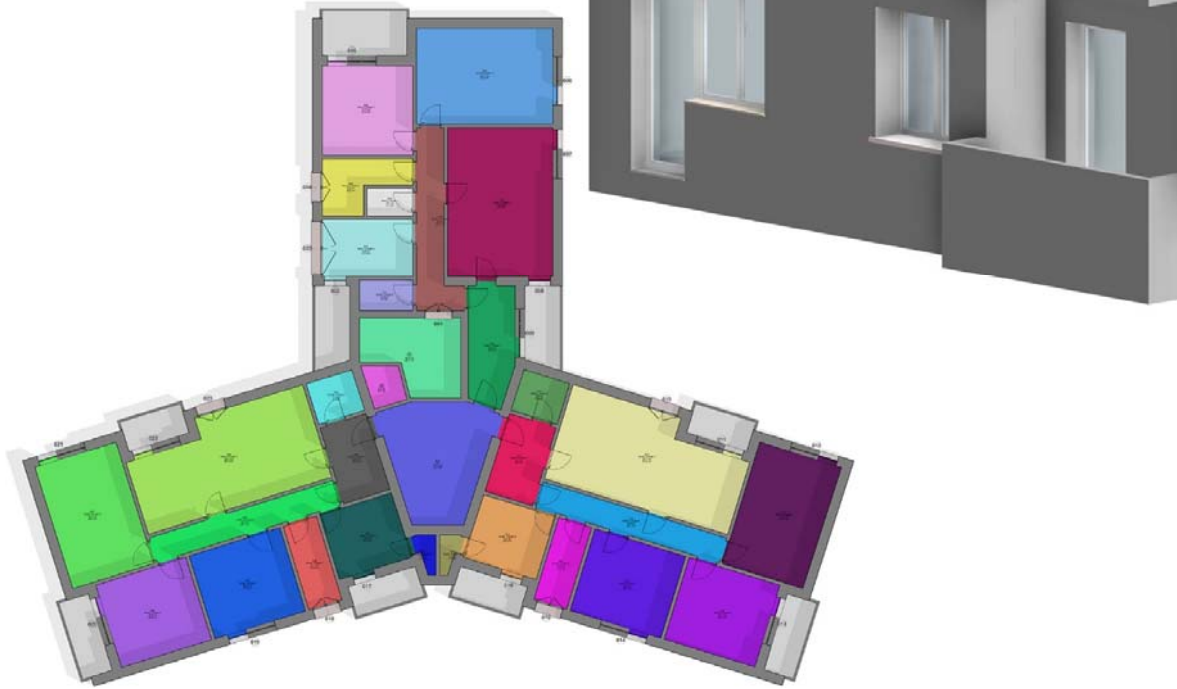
Type floor plan and axonometric portion of the simplified (LOD200) BIM model
